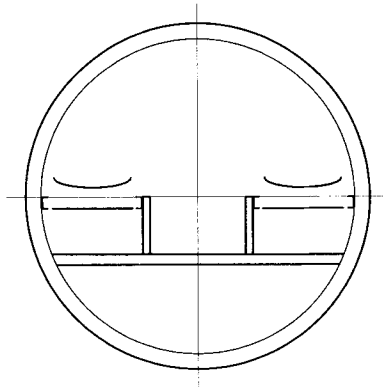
Cross-section of a belt conveyor bridge with two belt conveyors and a service walkway in the middle
